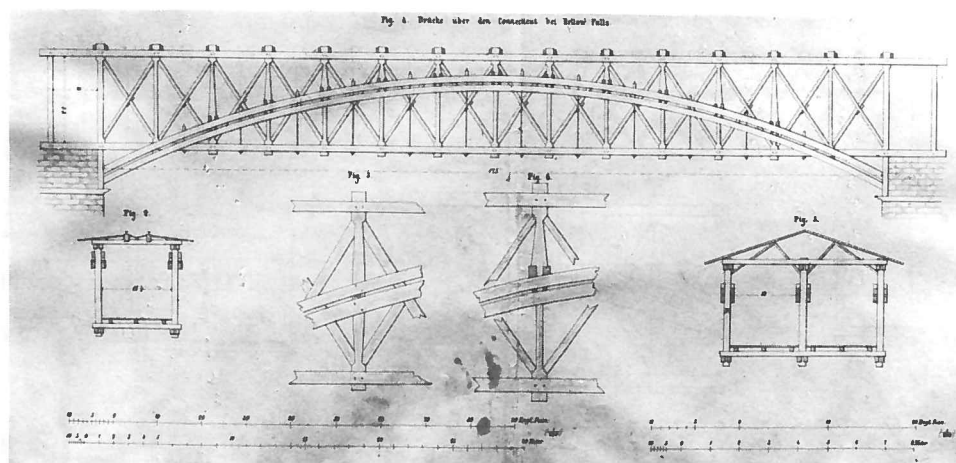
175-foot arch-braced truss over the river Connecticut at Bellow Falls [Culman 1851]
